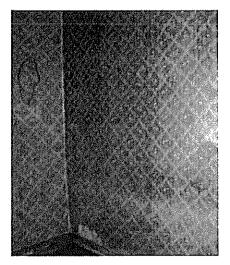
Wallpaper remaining on the wall covering of room 4 (Bedroom 1) (see Appendix A)
